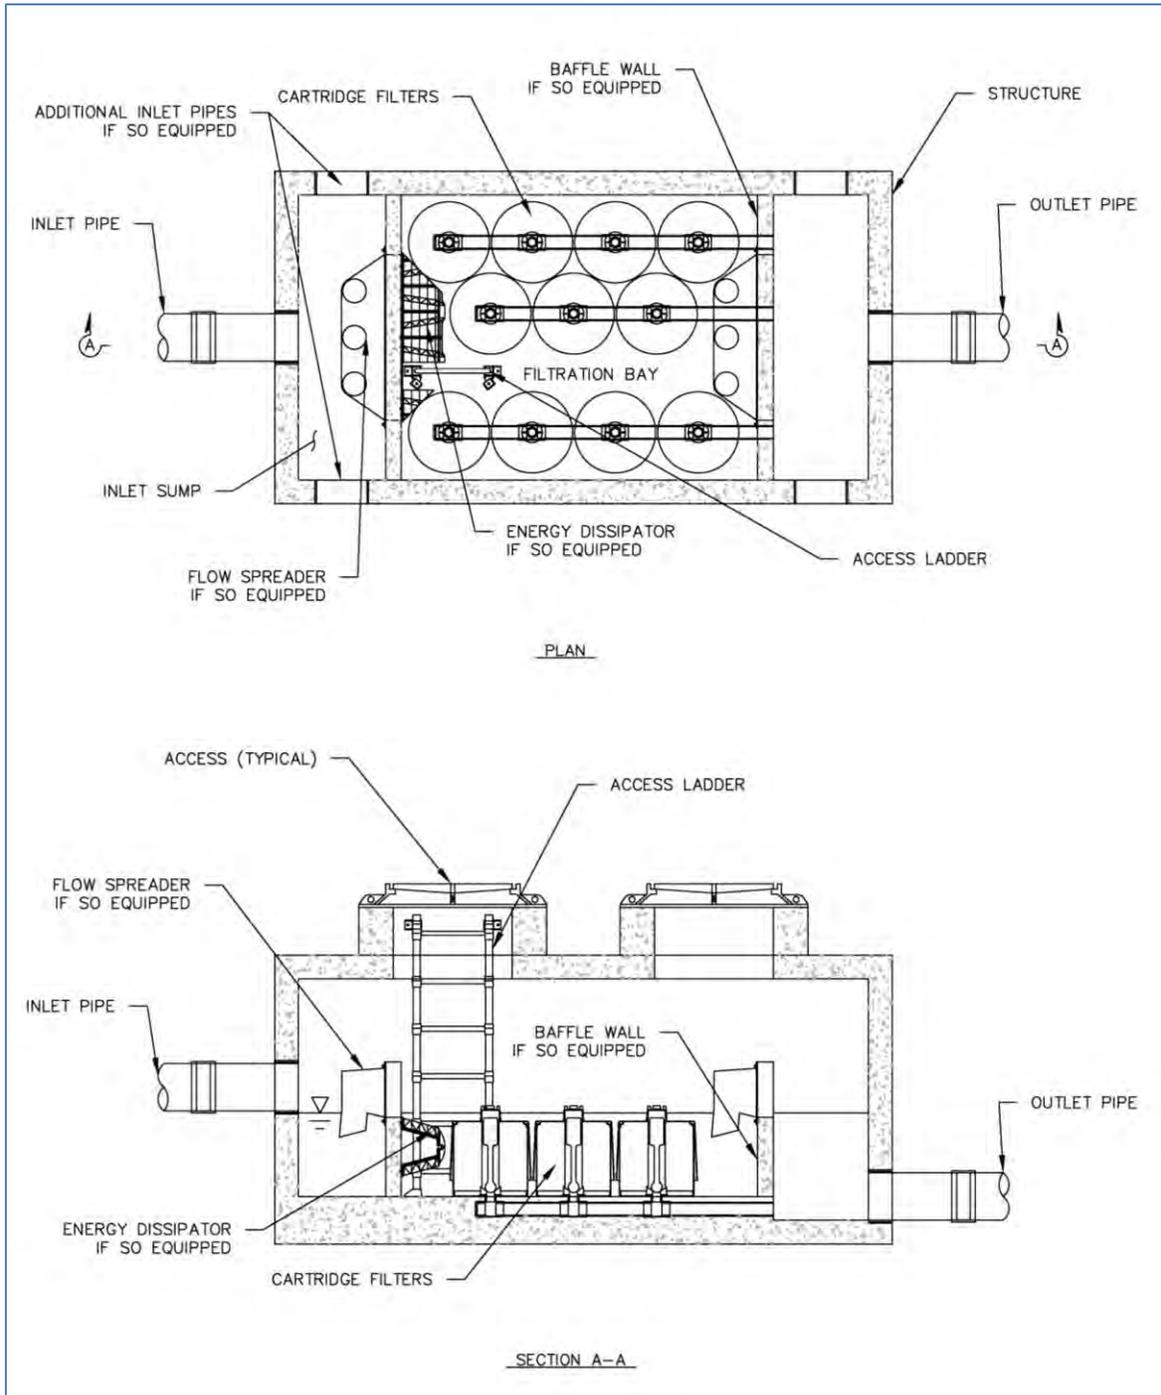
Cartridge Filter Schematic Plan and Section View (Not to Scale)¹
